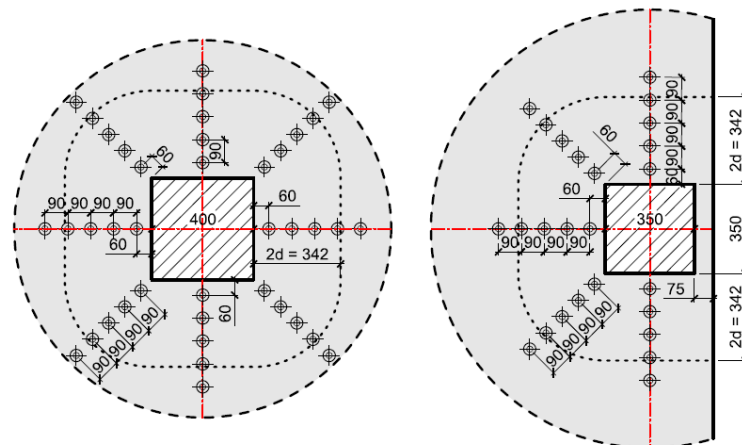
SlabSTRESS layout of strengthened connections at the 1st floor, a) C2, b) B1 and C3.
